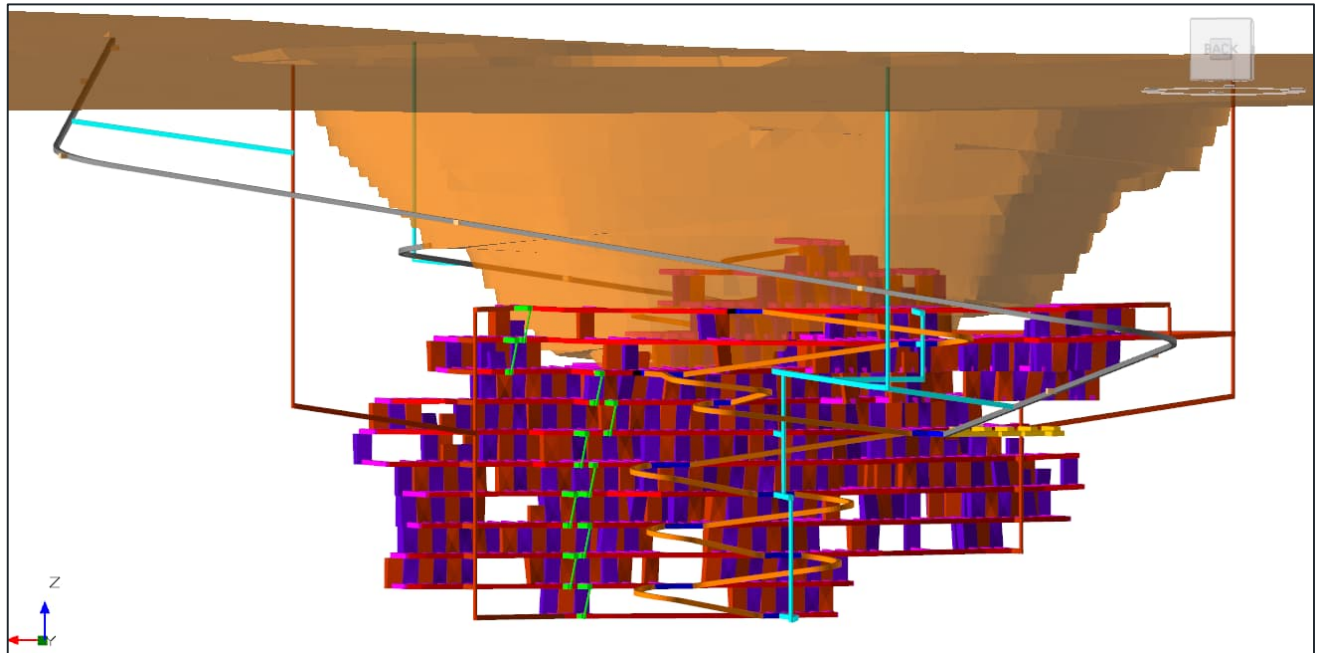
Underground Reserve Mine Design with Depleted Open Pit Looking North-West
